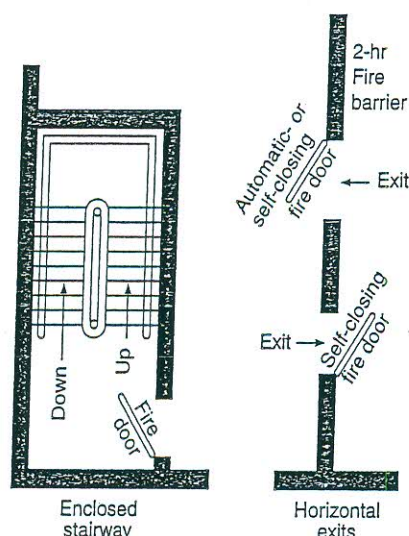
Plan Views of Types of Exits. Stair enclosure prevents a fire on any floor from trapping the persons above. A smokeproof tower is better, as it opens to the air at each floor, largely preventing the chance of smoke in the stairway. A horizontal exit provides a quick refuge and lessens the need for a hasty flight down stairs. Fire-rated doors must be arranged to be self-closing or automatic-closing by smoke detection.
